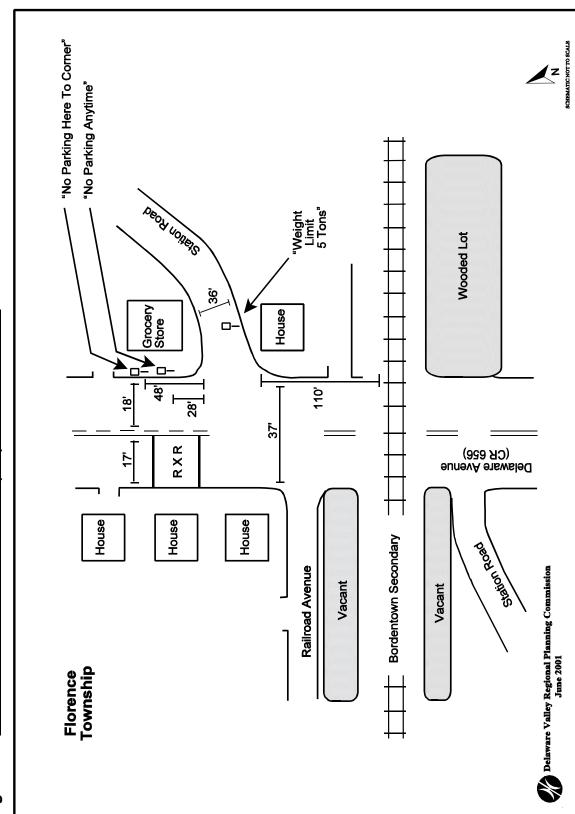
Intersection of Delaware Avenue (656) and Station Road
